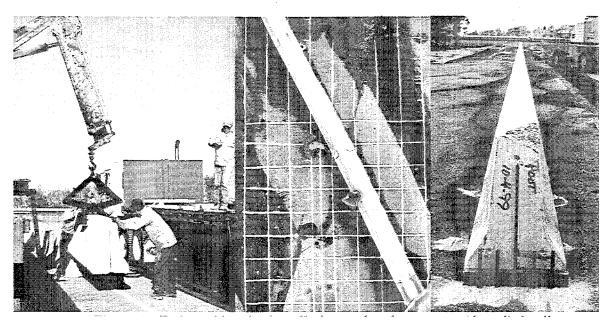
F-shaped barrier installation and end treatment (dowel) detail.
